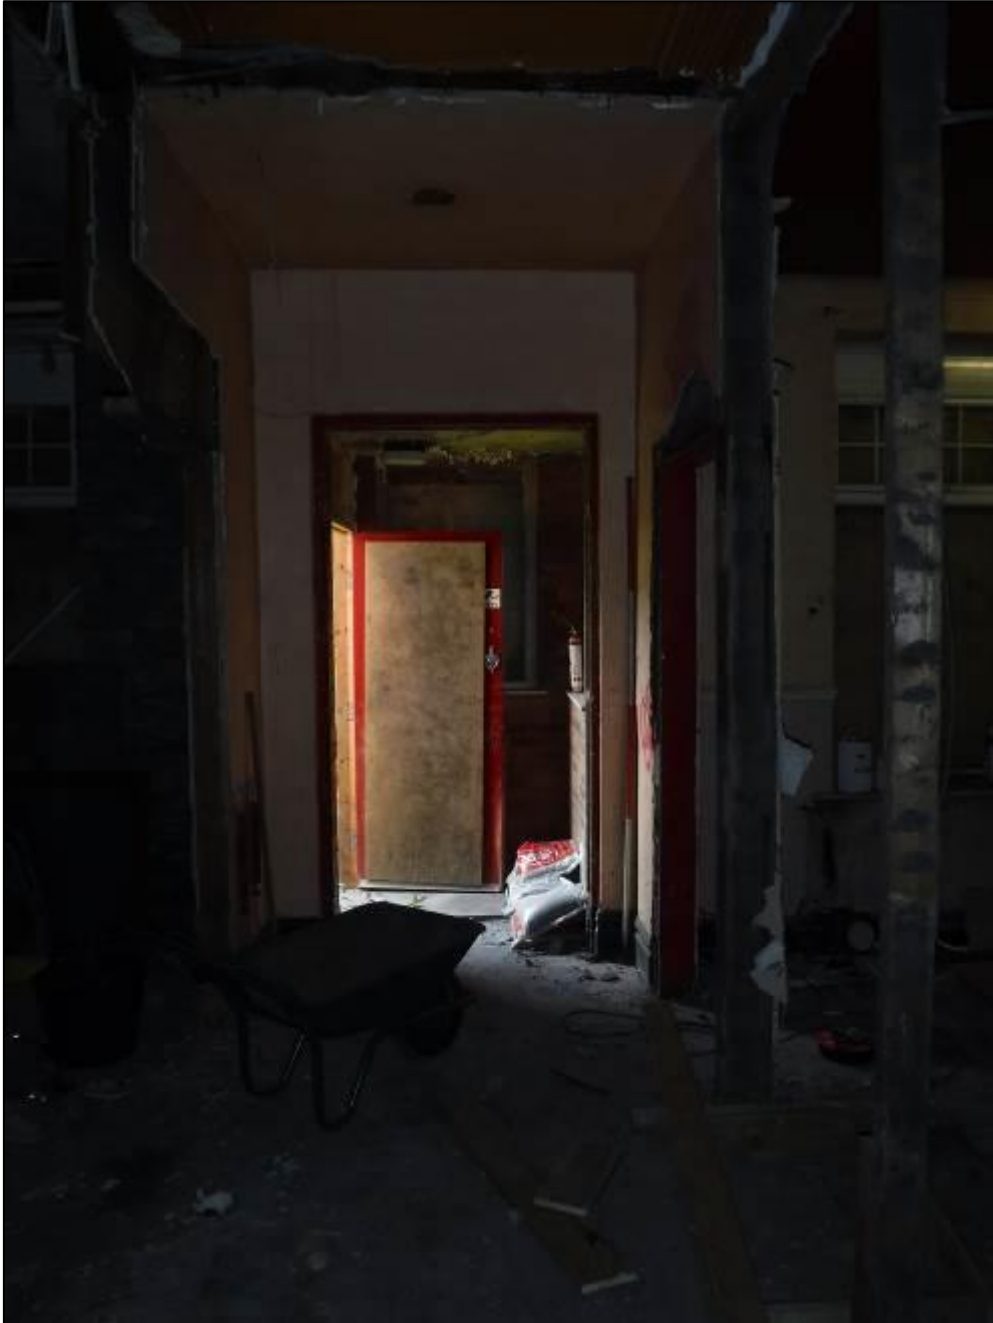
Ground floor, Room 3: view towards front entrance and porch, with Room 2 to the north and Room 4 to the south, west facing, 2m scale
